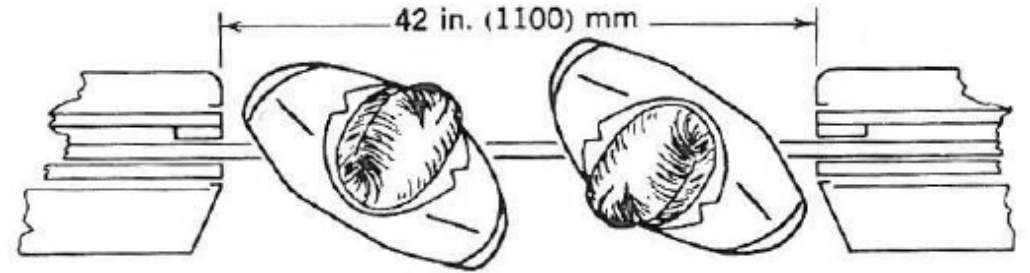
Nominal loading, 3500-lb (1600-kg) "passenger-shaped" elevator.
